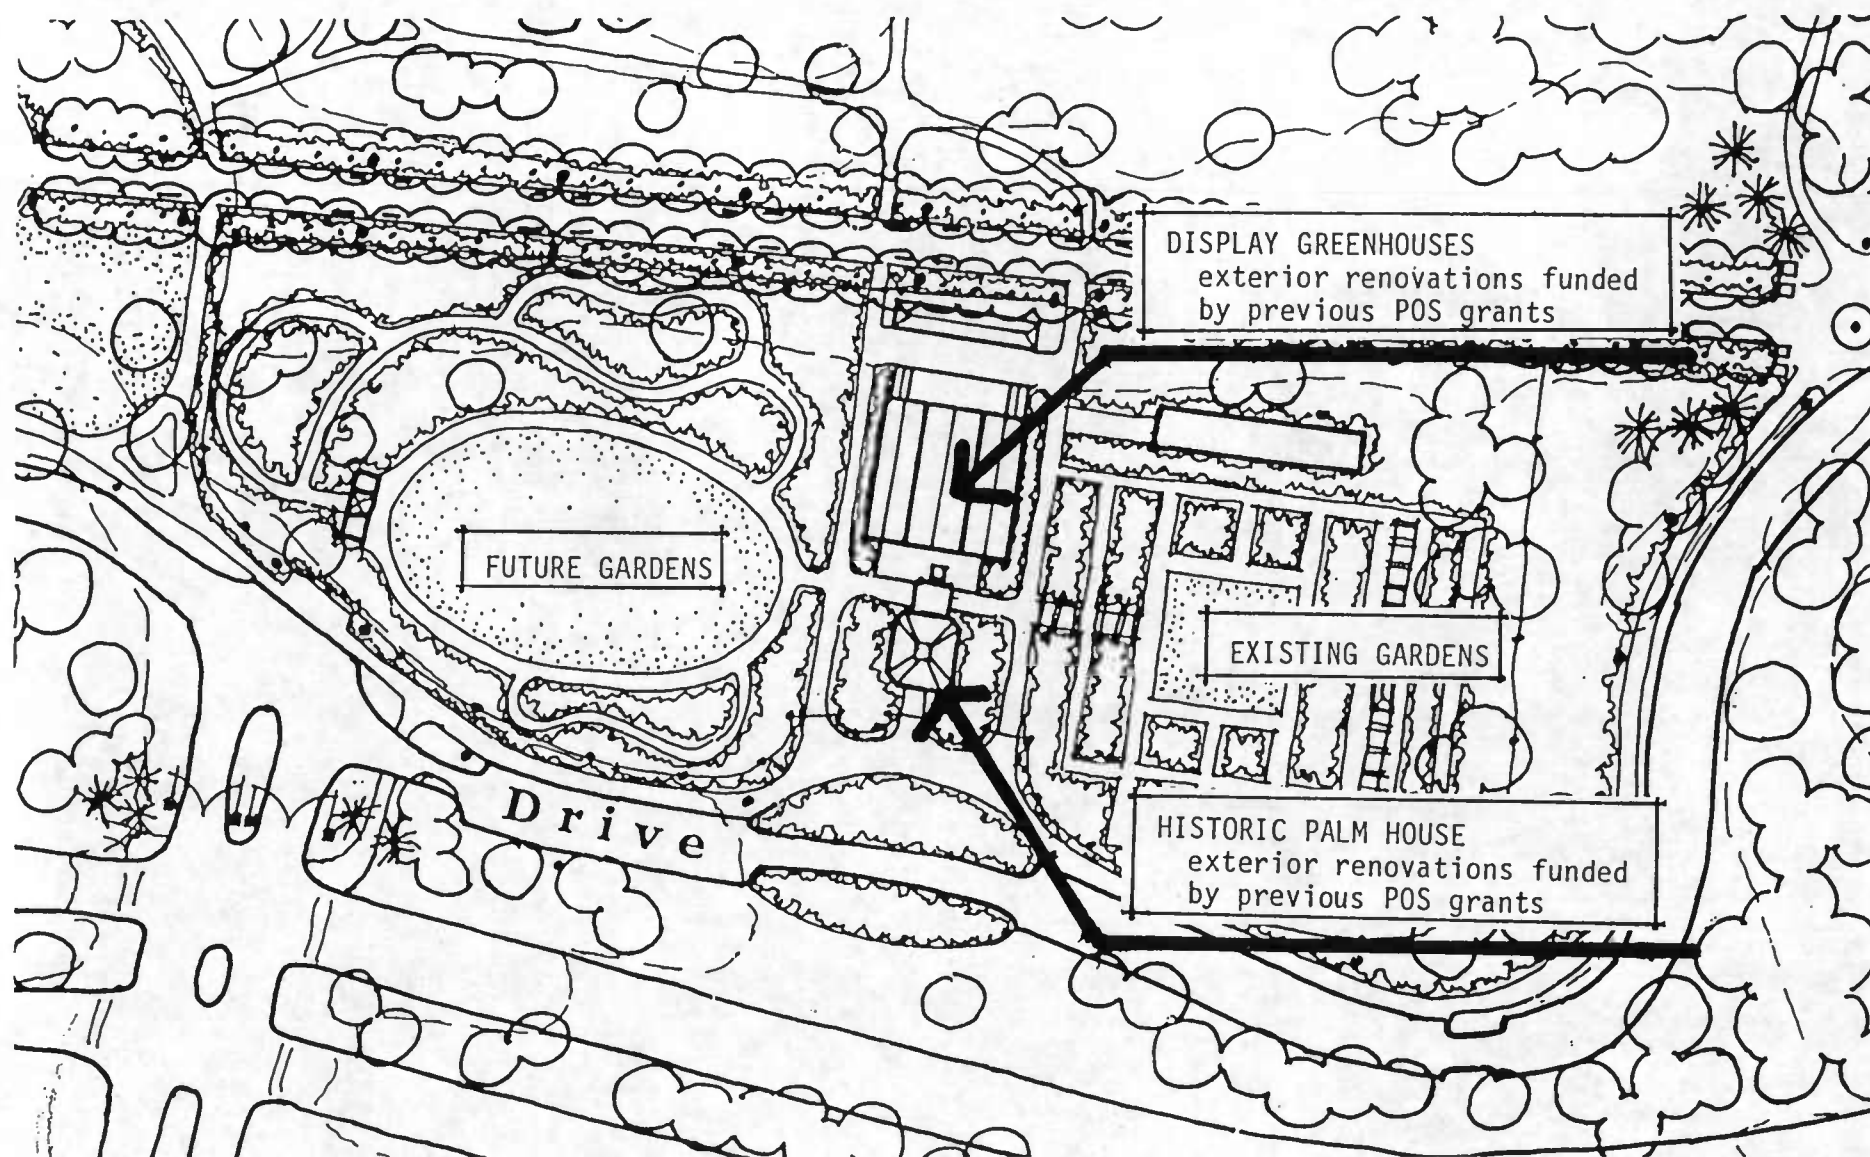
Area plan of Conservatory Palm House, center, and Gardens flanking both sides of greenhouses. Detail from *Renewing Plan, Vegetation*. LANDSCAPES, 1995.
